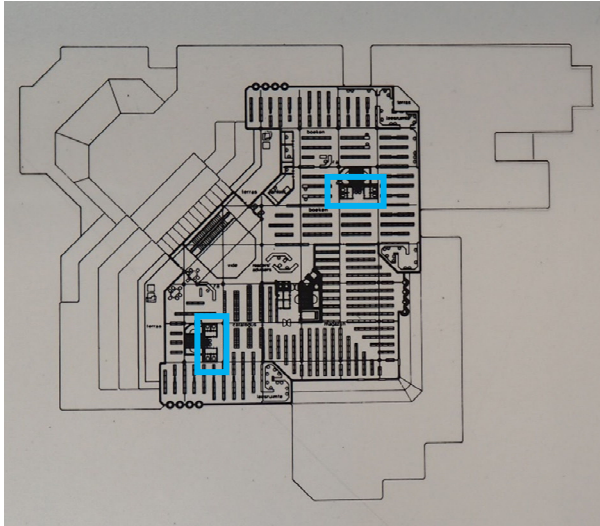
Floor plan level 5 highlighting small restroom areas (Van den Broek en Bakema, 1983a)
